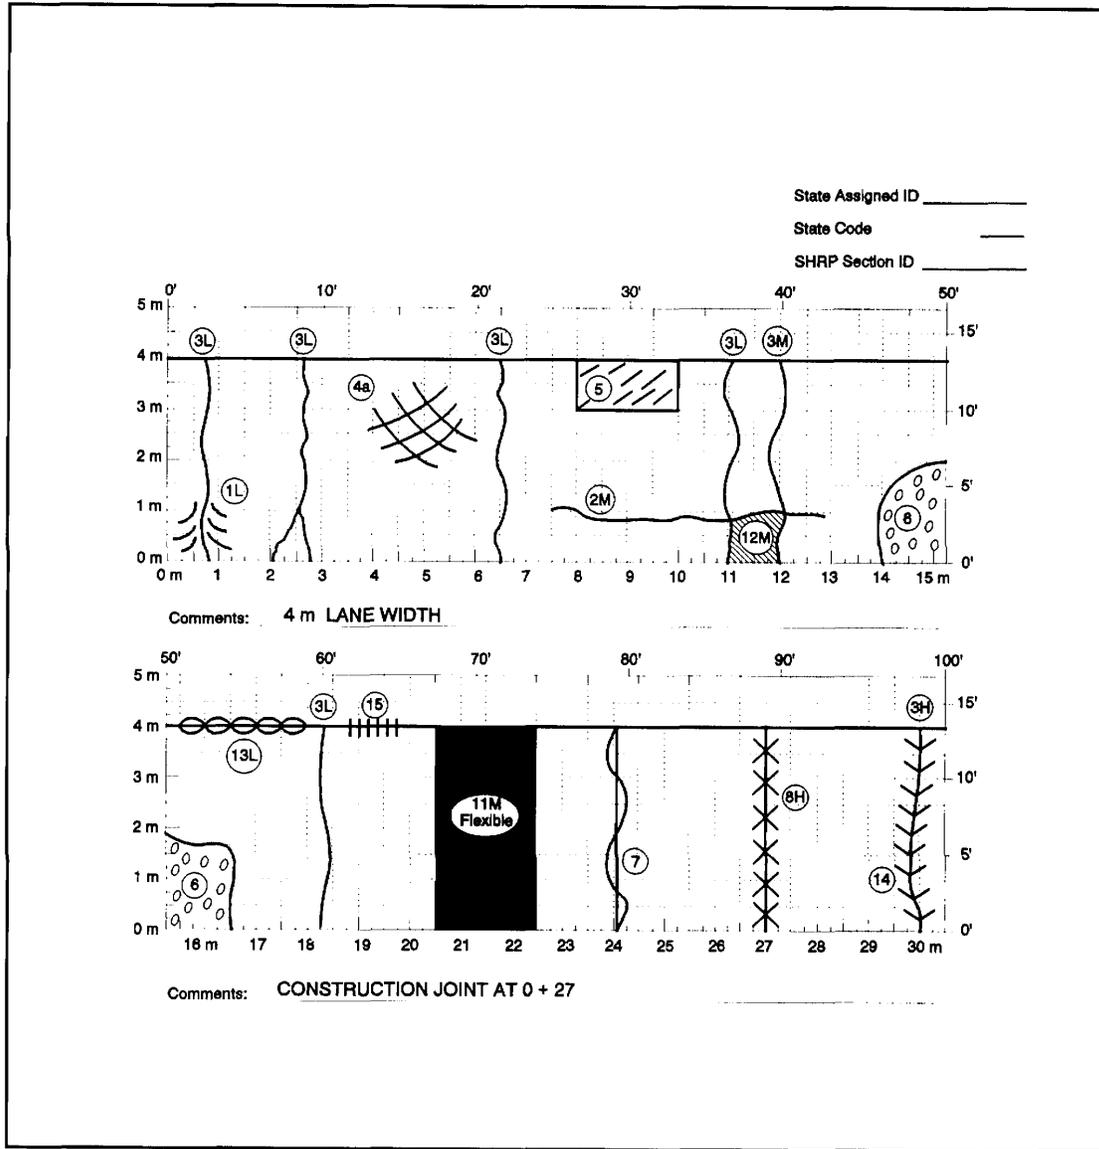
Example distress survey map for continuously reinforced concrete pavement.¹¹
